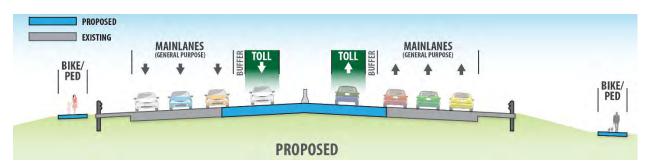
Typical Sections near Presidential Boulevard and at SH 130
